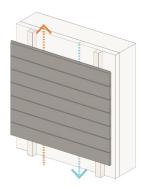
Single-layer frame when cladding boards are installed horizontally
